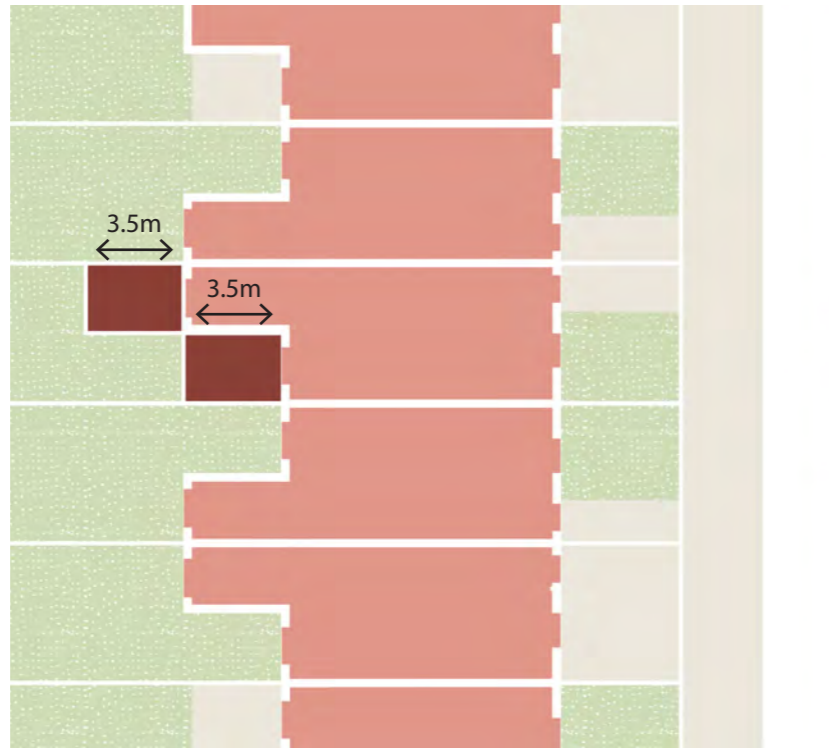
A dog-legged extension where there is an existing outrigger.
